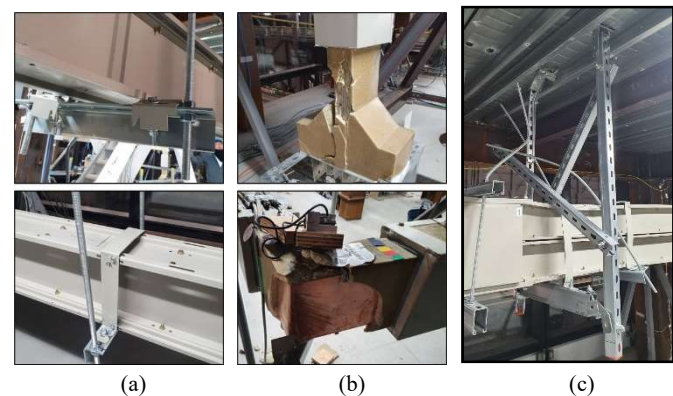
(a) Failure of traditional fixtures; (b) cracked cast resin busway; (c) failure of braced frames
